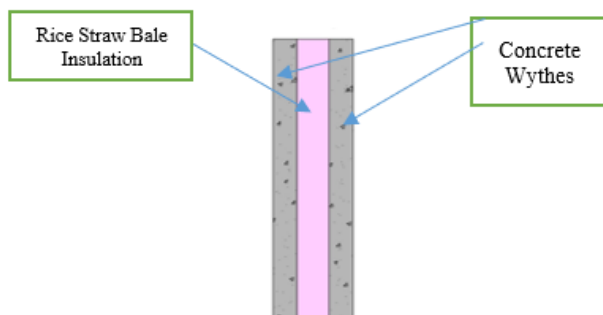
Cross Section of Precast Panel with rice straw bale thermal insulation
